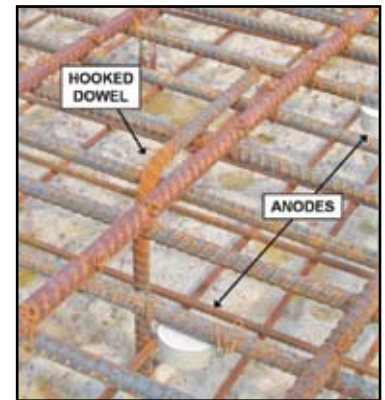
Hooked dowel and disc-type anodes prior to installation of repair concrete
